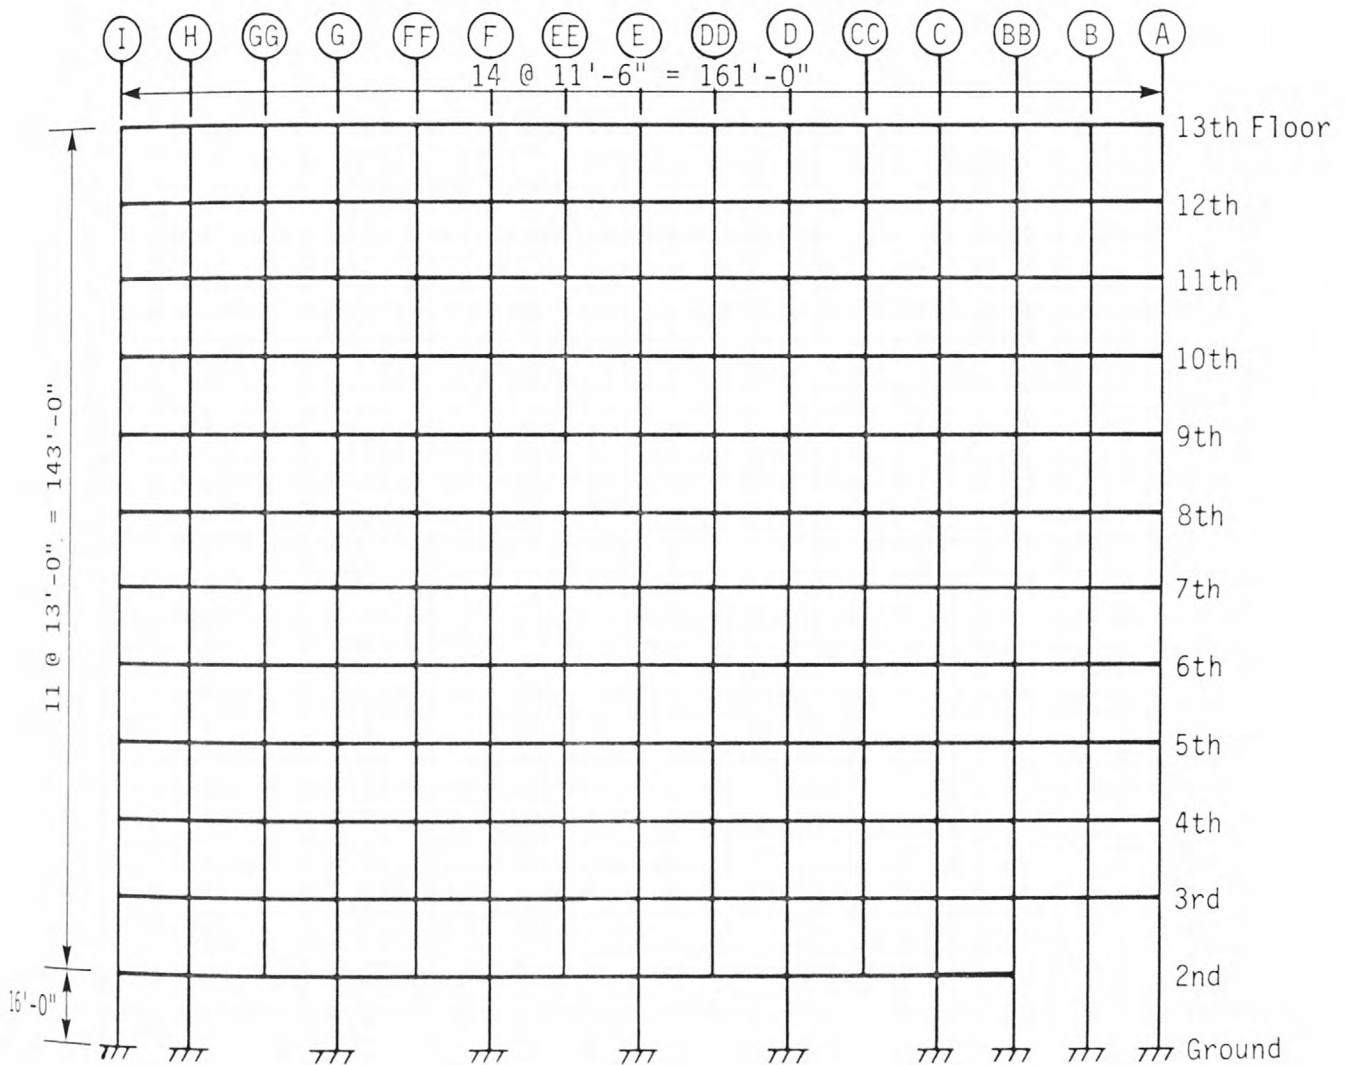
BANK OF CALIFORNIA BUILDING: LONGITUDINAL FRAME ON COLUMN LINE 3
